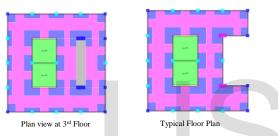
Model 3 Flat Slab with Columns and Shear Walls (G+25)
